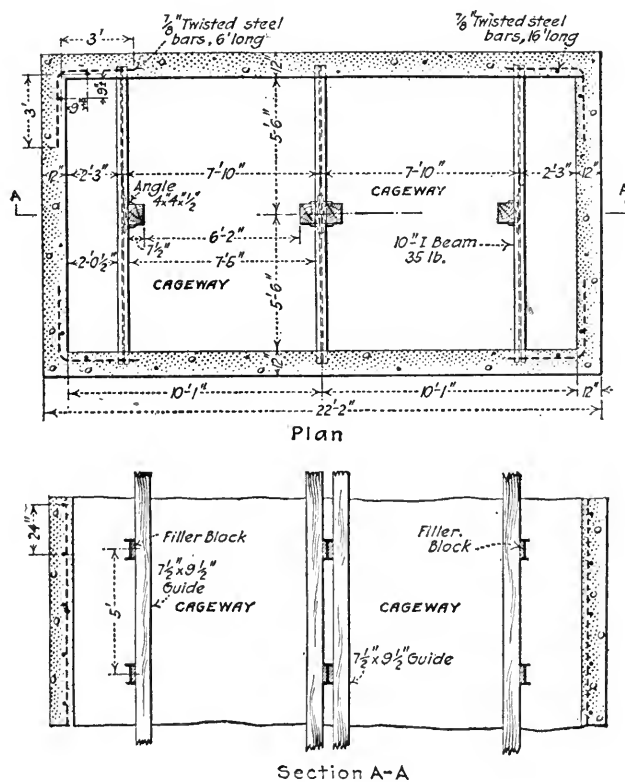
PLAN AND SECTION OF CONCRETE LINING.
